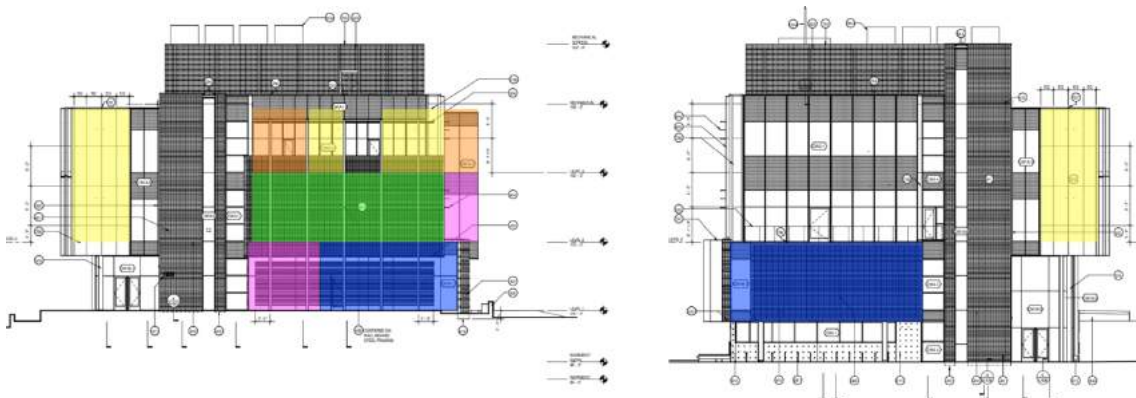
CoorsTek Center - East and West elevations (Source: Architectural plans)
